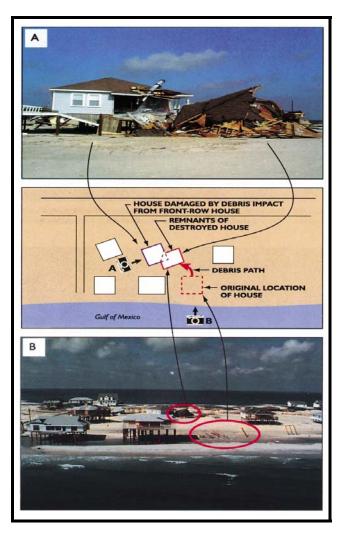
One house collapsed during a storm and washed into another building, showing the need for additional requirements on the coast.
